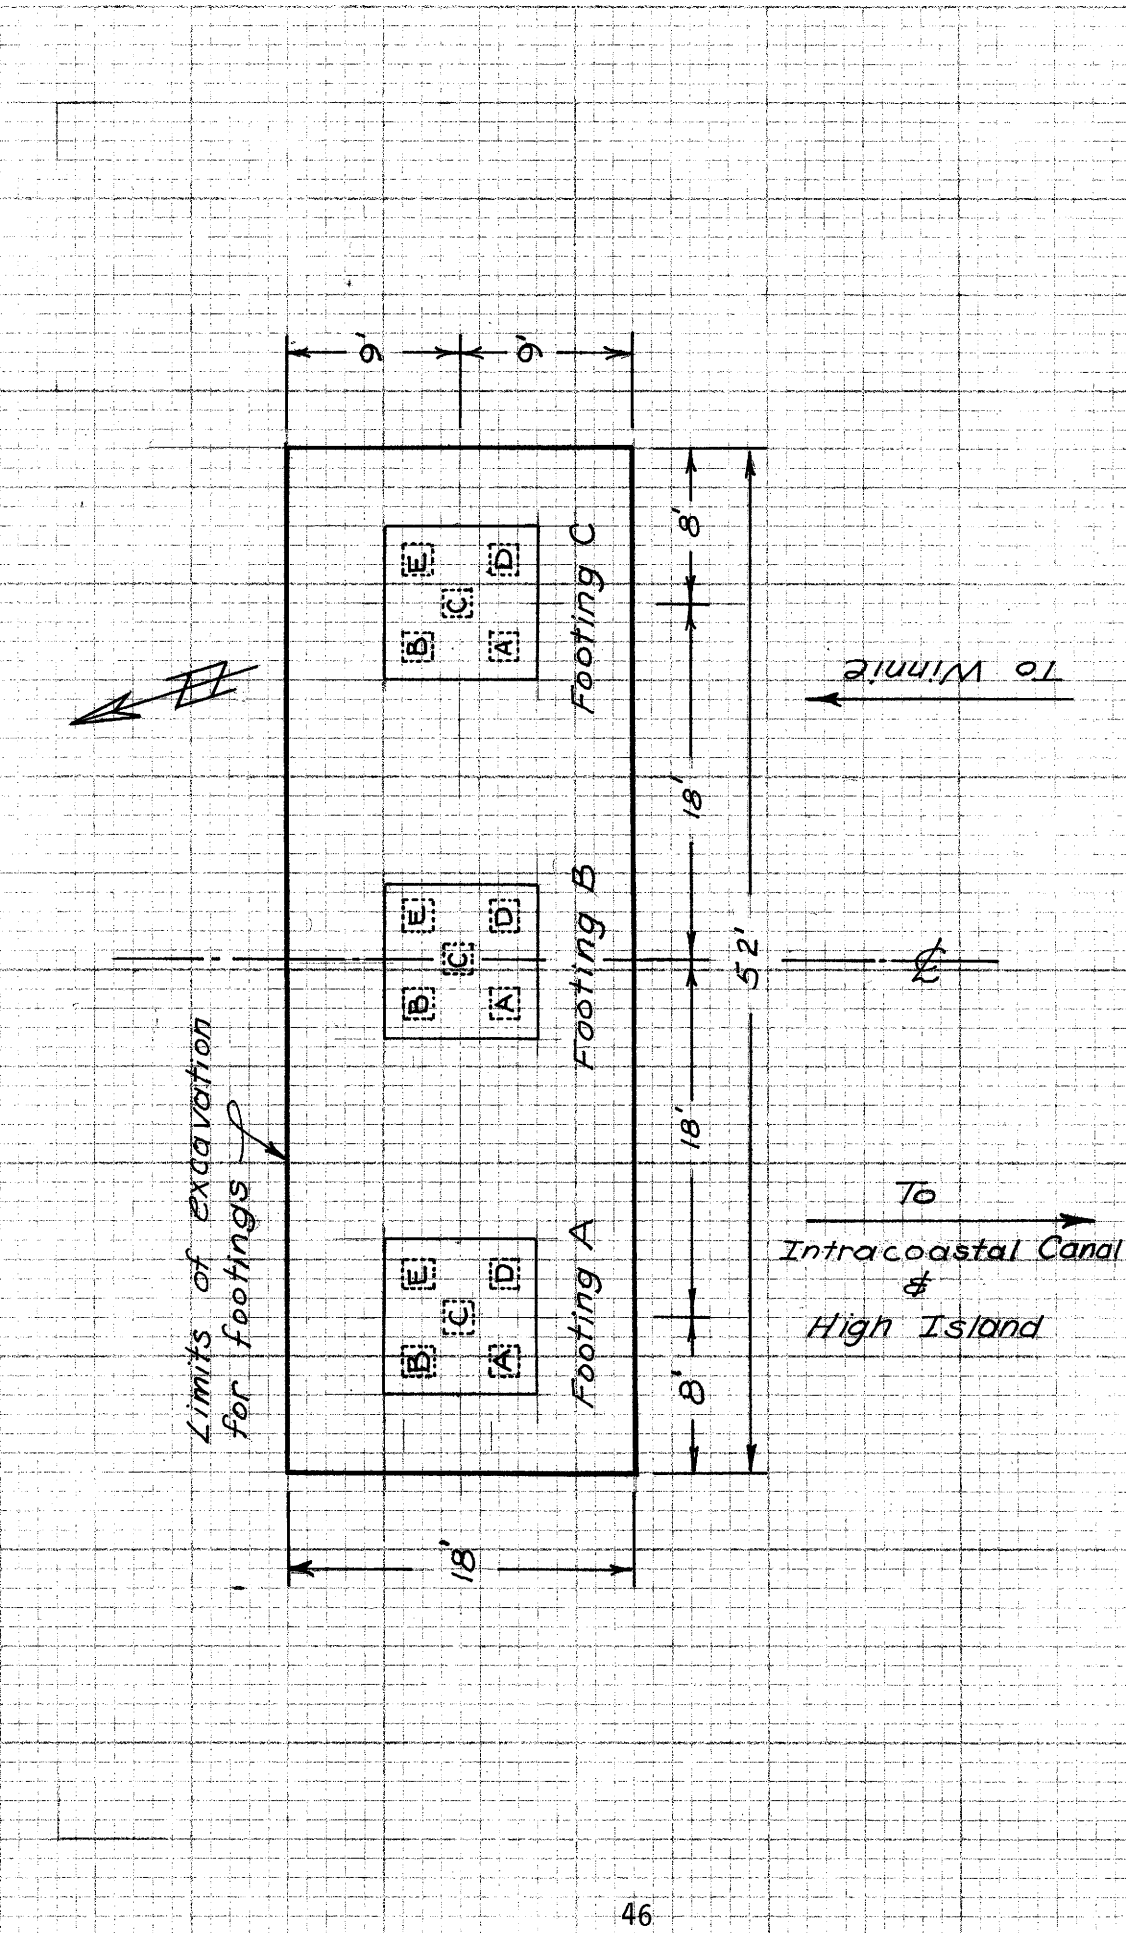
PLAN VIEW OF EXCAVATION AT BENT 34 SHOWING LETTERING SCHEME FOR IDENTIFICATION OF PILES AND FOOTINGS
